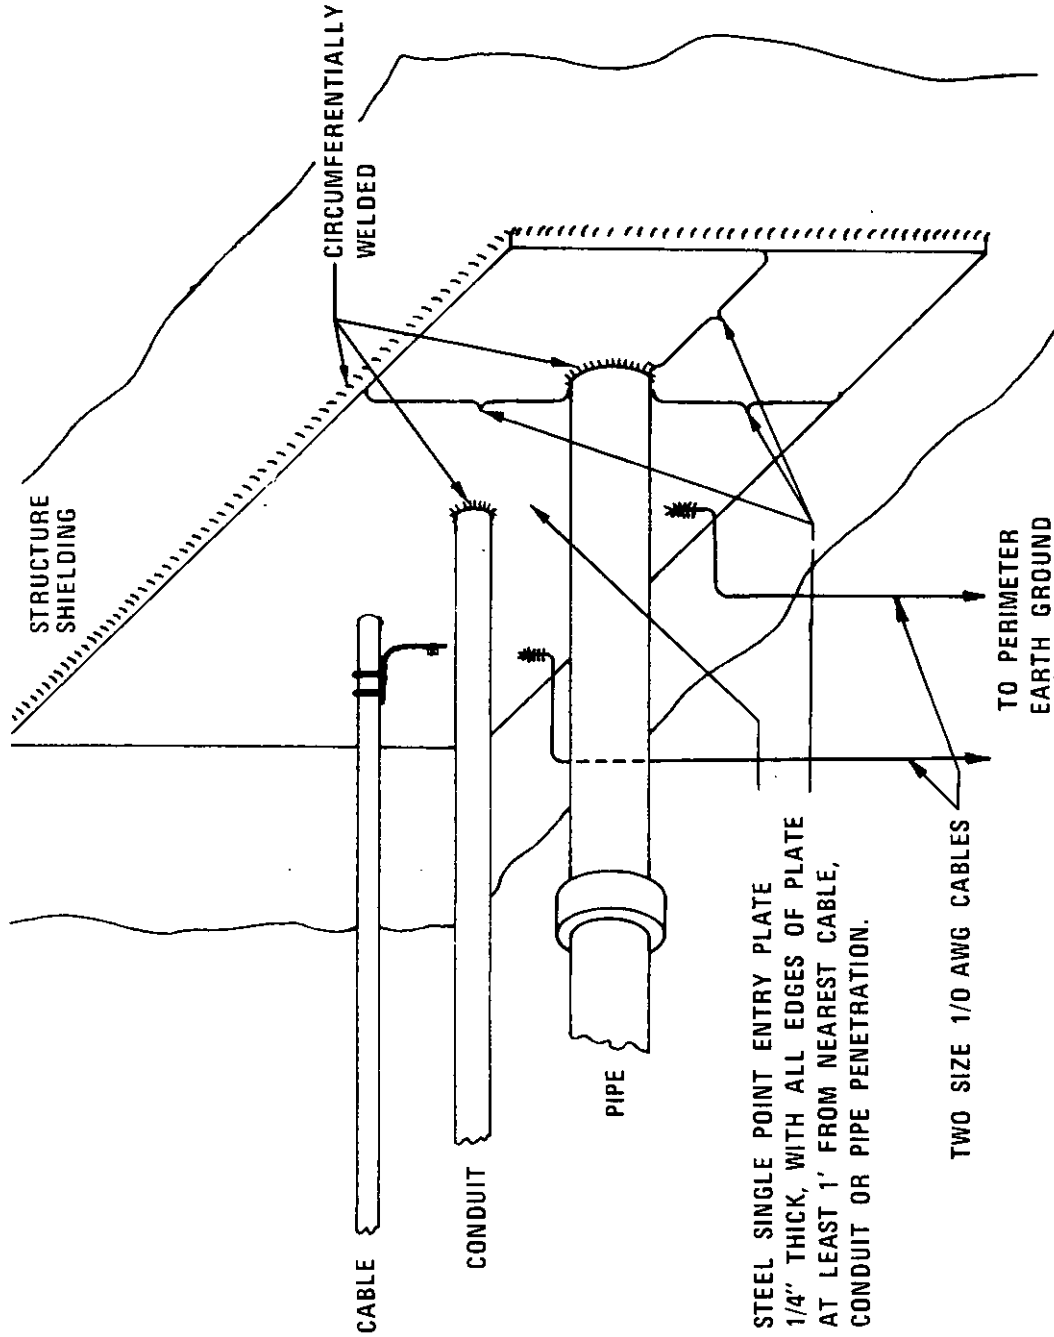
Typical Entry Plate Showing Rigid Cable, Conduit, and Pipe Penetrations
